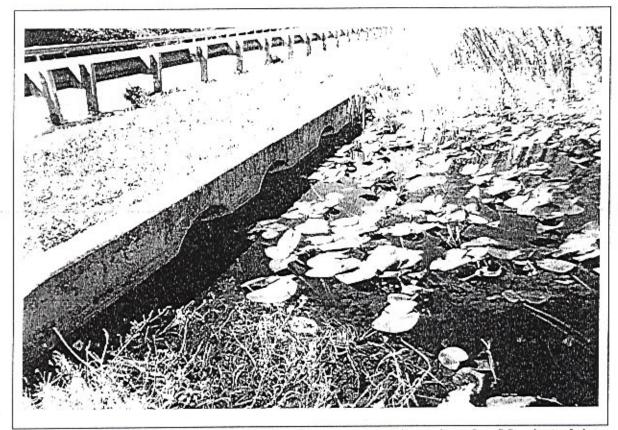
Typical northern culvert opening headwall intaking water from adjacent Tamiami Canal with slow flow through moderate wetland and aquatic vegetation.
